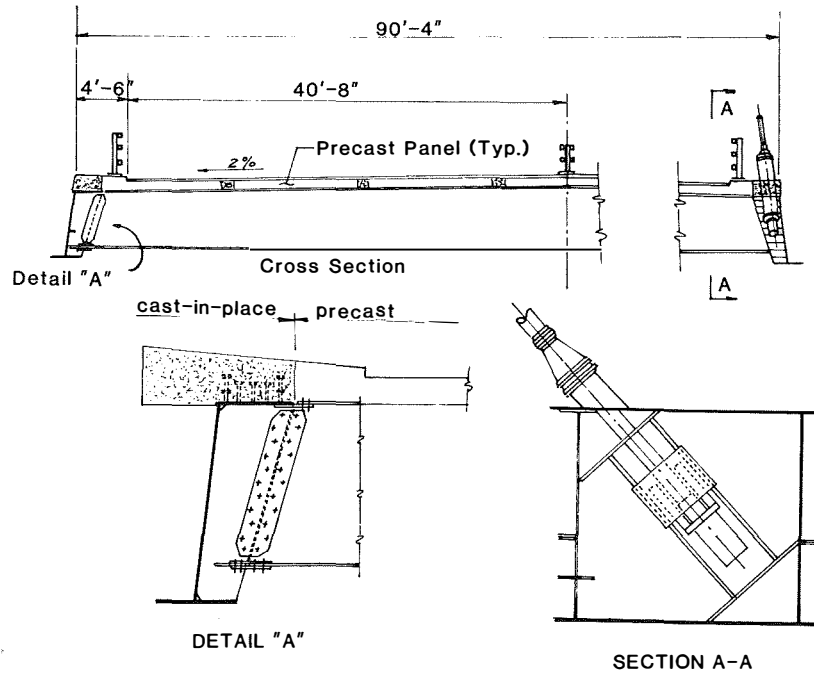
Sunshine Skyway Steel Alternate, superstructure cross section and details.
